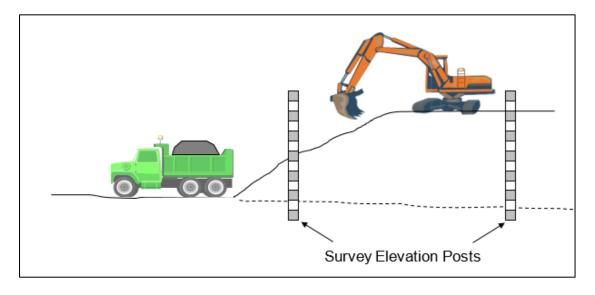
Schematic cross section of ilmenite stockpile/dump showing GER proposed excavation and load arrangement with survey elevation posts used to control dig depth to natural ground surface.
